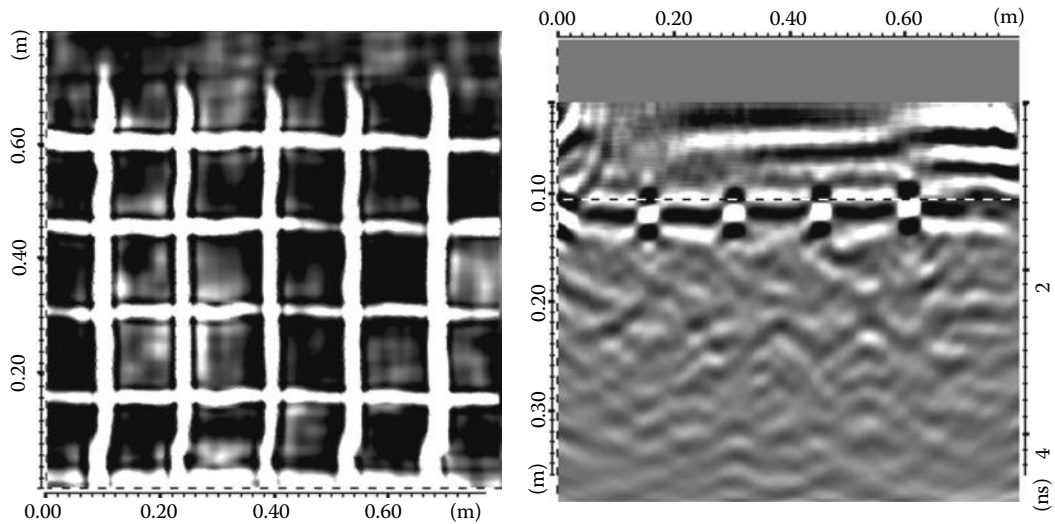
Plan view and radar cross section of rebar in concrete. (Courtesy of Malå Geoscience.)
